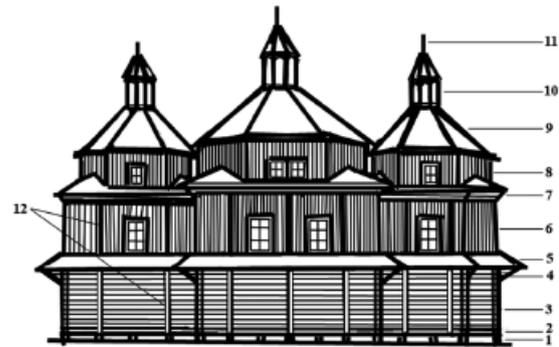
Timber facade of a Greek Catholic church constructed according to regional building traditions. 1 – Foundation (oak or birch pecks, field stones, stone or brick underpinning), 2 – Ground beam (the thickest beam made of the most durable timber – oak, birch), 3 – Log frame, 4 – “lynxes” – (horizontal) protruding tie-beams often decoratively profiled, 5 – Canopy (covered with shingle or metal sheets/plates), 6 – Upper part of the structure covered with shingle or vertical siding, 7 – Cornice crowning the walls, 8 – Cupola drums (shingled or vertically sided), 9 – Cupolas or roofs covered with shingle or metal sheets/plates, 10 – Lanterns (covered with shingle or metal), 11 – Crosses, 12 – “Vixens” – vertical supporting beams preventing buckling
